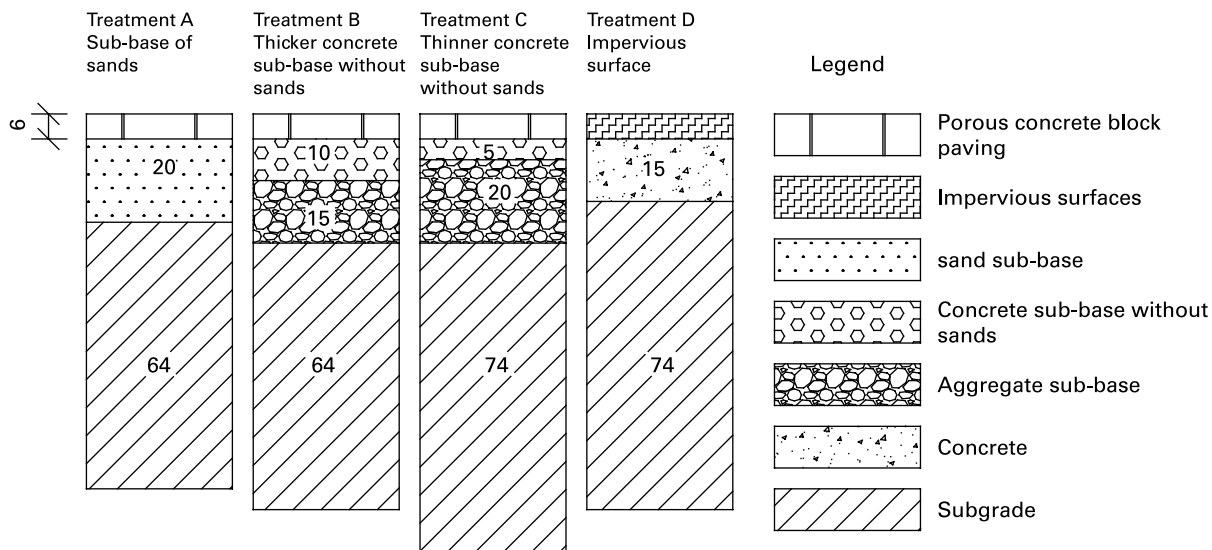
| Typical cross section of porous pavement and impervious pavement. The thickness unit is the centimetre.
